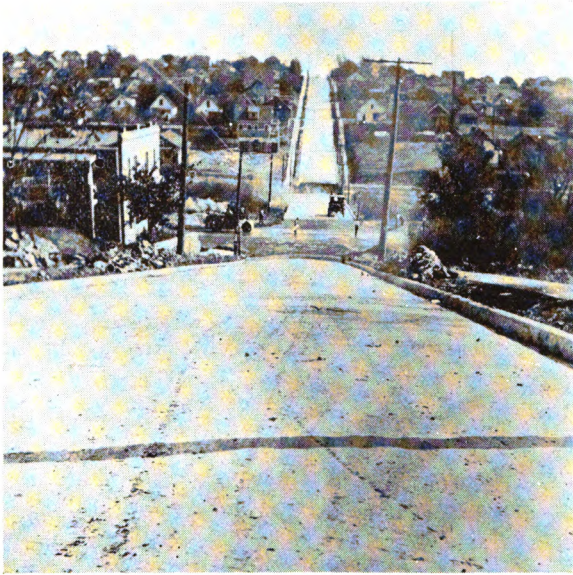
An Ideal Location for a Plain Concrete Pavement
